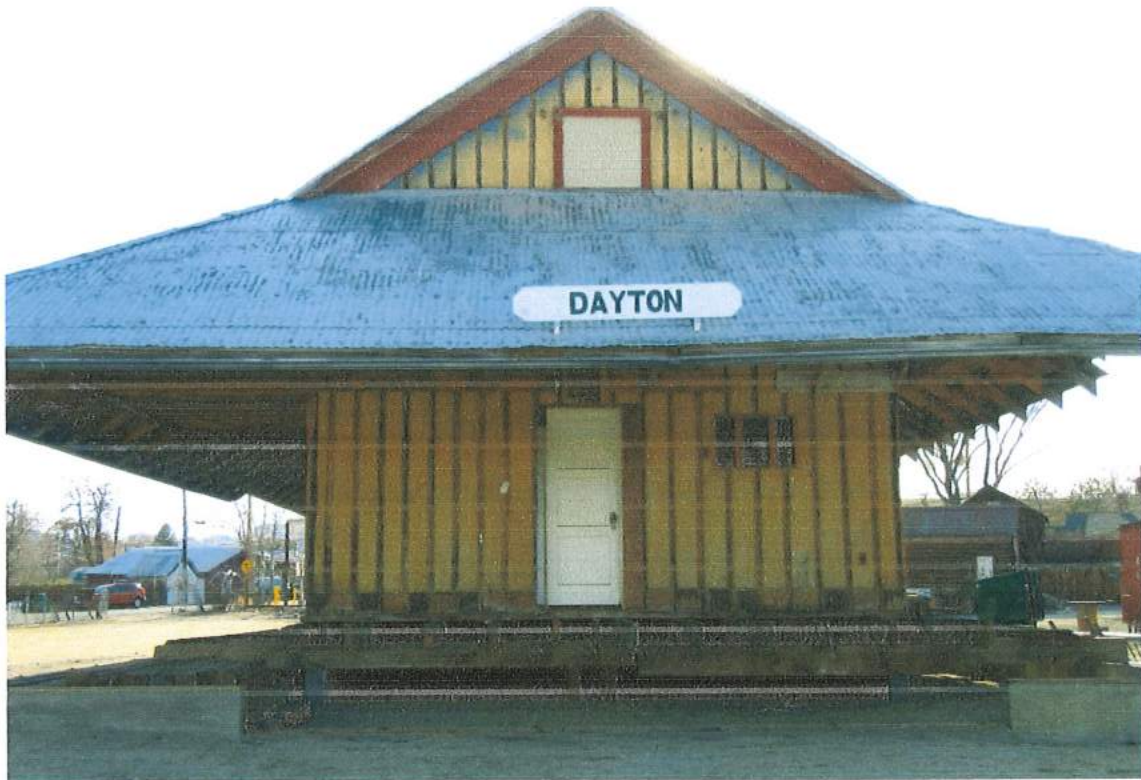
Elevation from NE, Keeler end, end of freight room. Window above (boarded up) is original. Door and window at end are resident-added and will be filled in.
